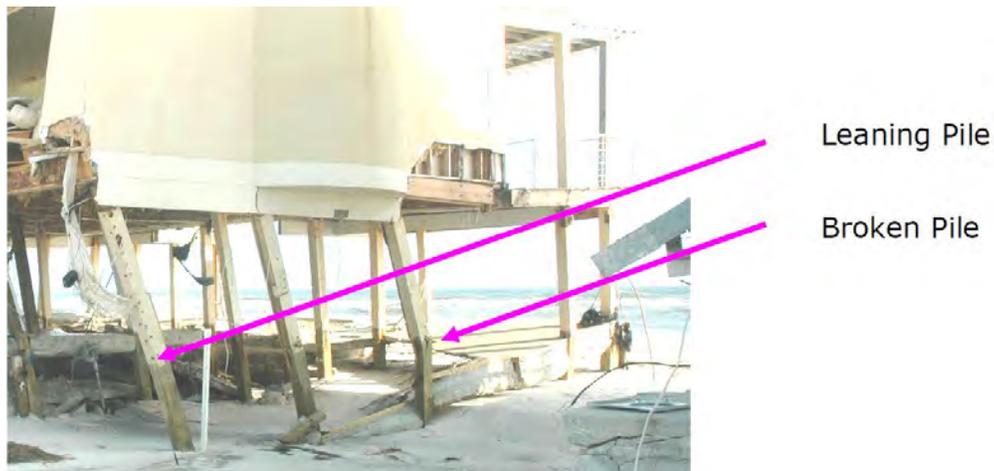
Leaning or broken piles. (Photo Credit: US Army Corp of Engineers)
